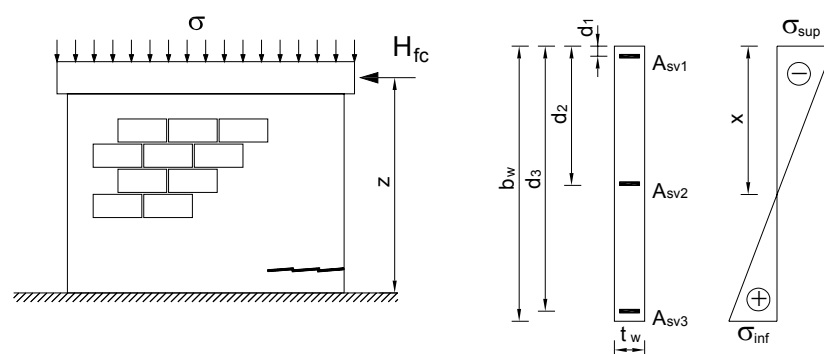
Stress distribution along the section of the wall to calculate the flexural cracking load.
